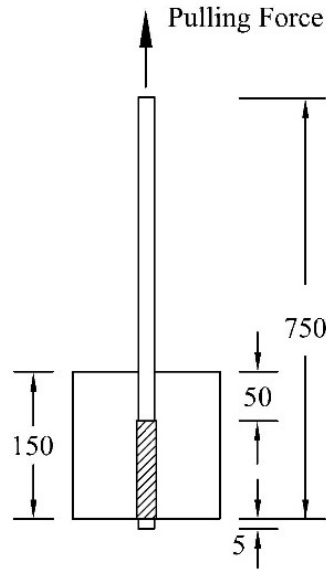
Details of specimens for pull-out test (All dimensions are in mm).
